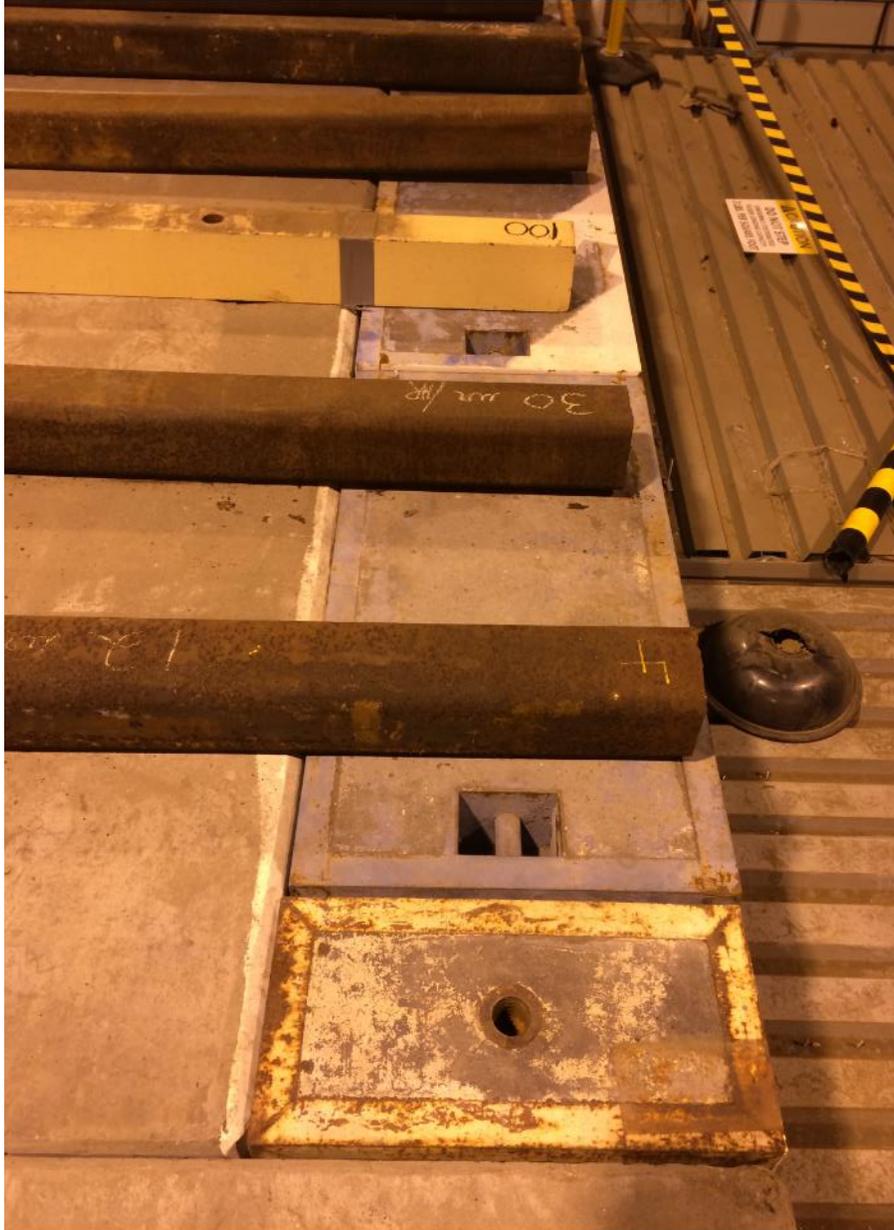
Photo II: The roof beams have been moved to the west so that two feet of concrete can cover the seams between blocks to the side. The roof of the utility building is seen at the right hand side. The steel bars block rays that penetrate partially through the roof seam.
